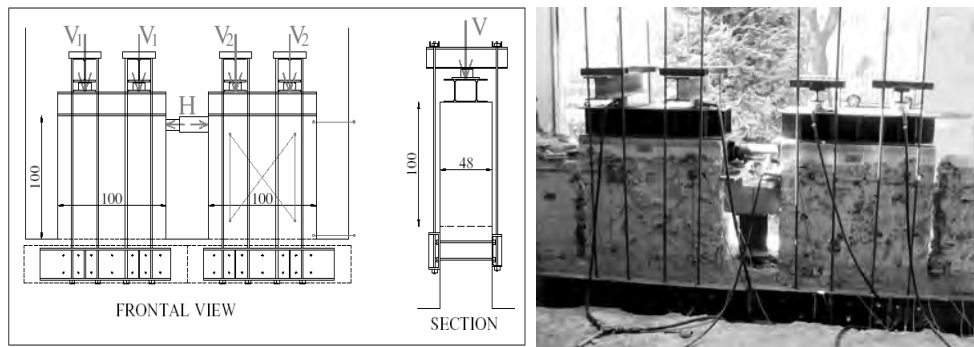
Opposite-Panels in-situ test: set-up and view of a sample tested.
